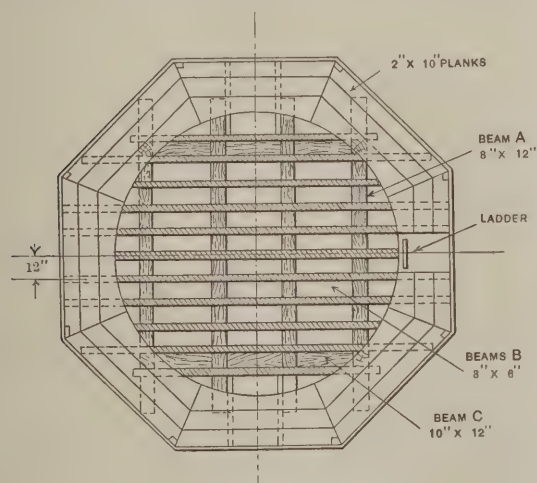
Plan of Platform.—Scale,  $\frac{1}{8}$  In. to the Foot.
